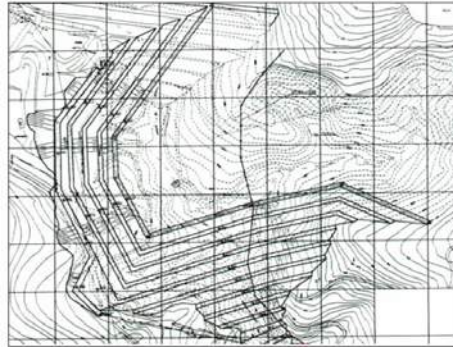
Final plan view of Monjolo Dam. (modified – Geoconsultoria, 1997).
